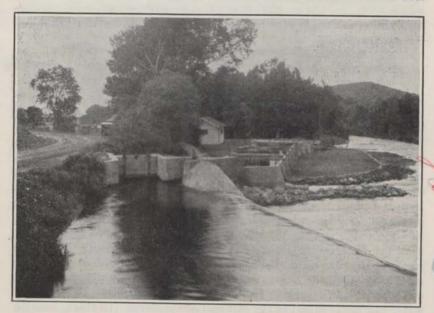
Irrigation Hydraulic Laboratory at Bellvue.
